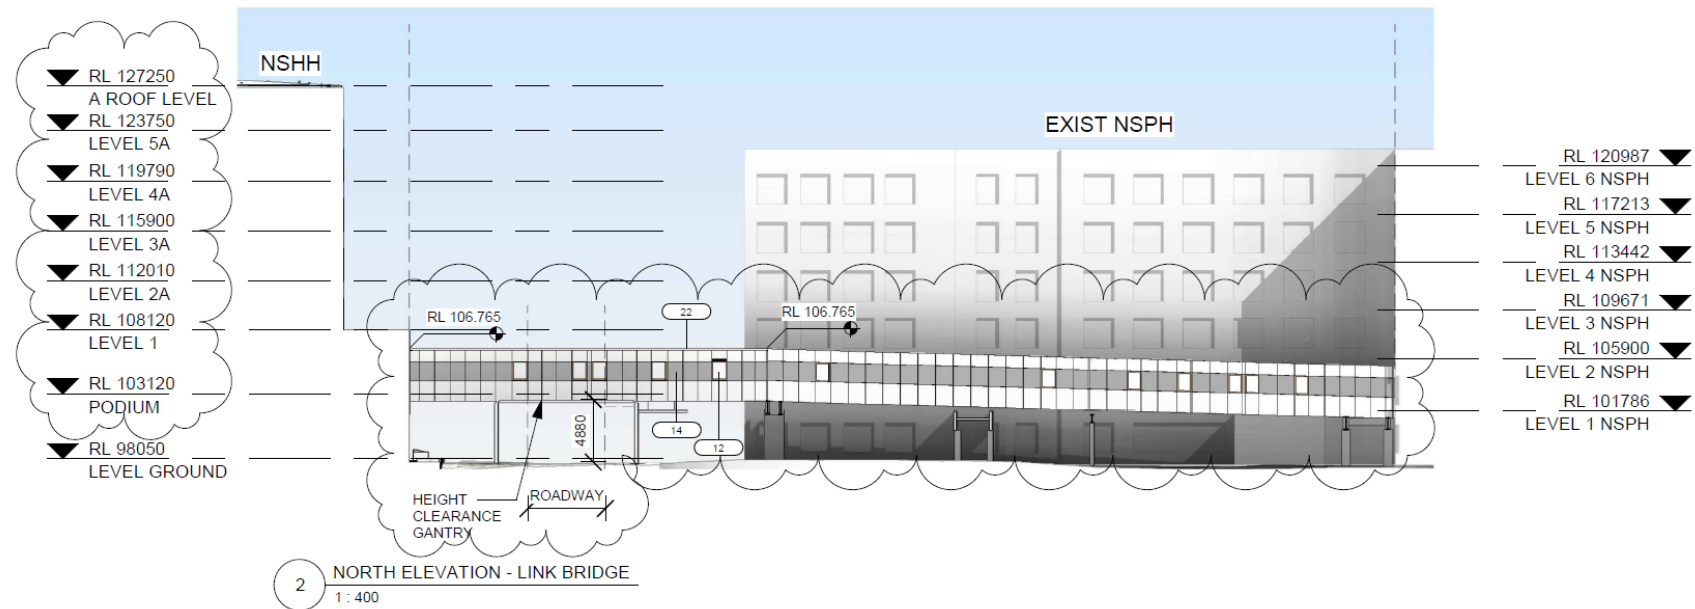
Proposed north elevation (Source: Billard Leece Partnership)
